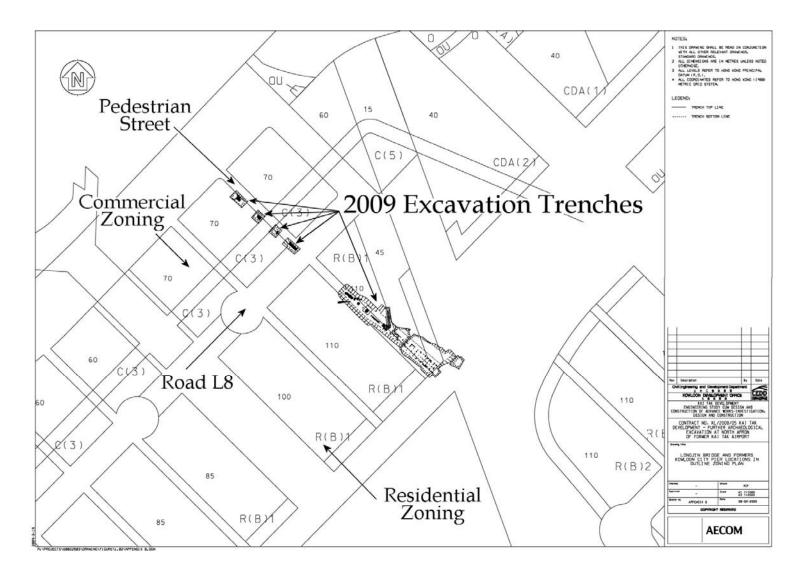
Trenches of 2009 excavation on Kai Tak Outline Zoning Plan (OZP No.S/K/22/2)
